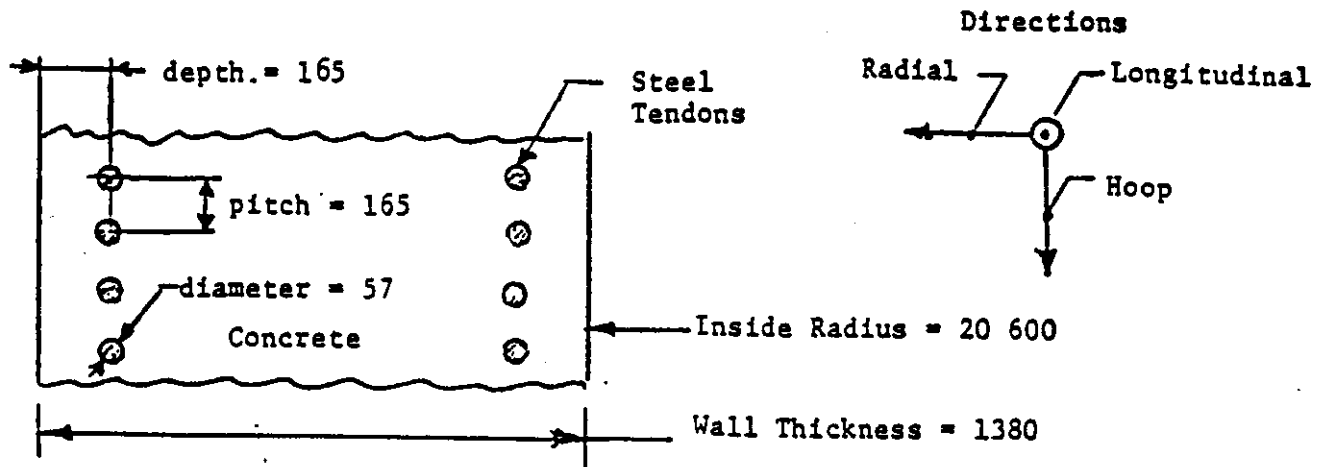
Section Normal to the Longitudinal Axis of the Containment Shell (dimensions in mm).
